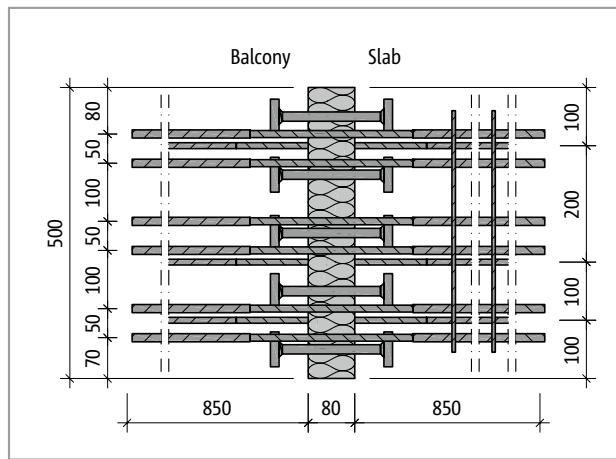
Schöck Isokorb® T type K-M12-V1: Product layout
